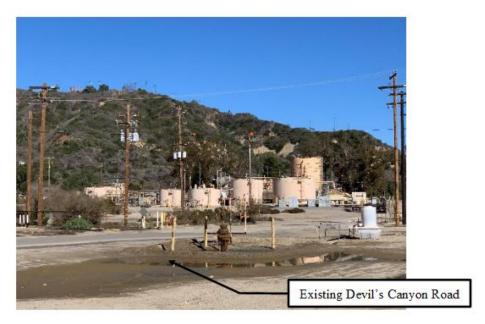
Existing conditions at the Devil's Canyon Road Site (Close-Up of Tanks)
